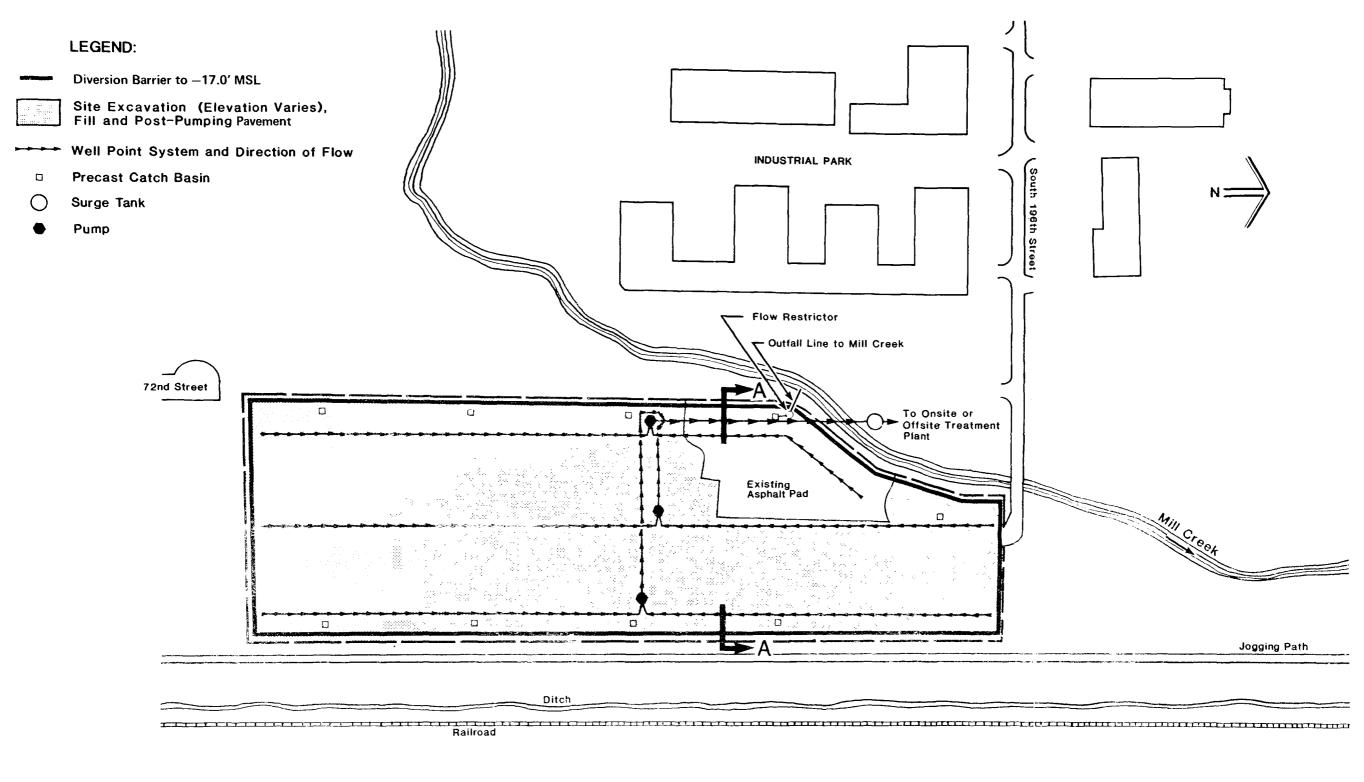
shows a plan view of Example Alternative 5. It consists of soil excavation, groundwater pumping to dewater the excavation, and subsequent groundwater treatment. The excavation program would last four years. Soil excavation would occur during five months of each year. The dewatering system would operate throughout the four-year period.
